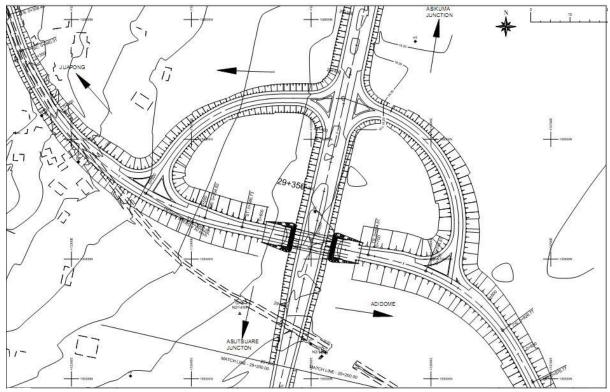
Layout of Dufor Adidome Interchange CH. 29+350 on Section 3 Project Road
